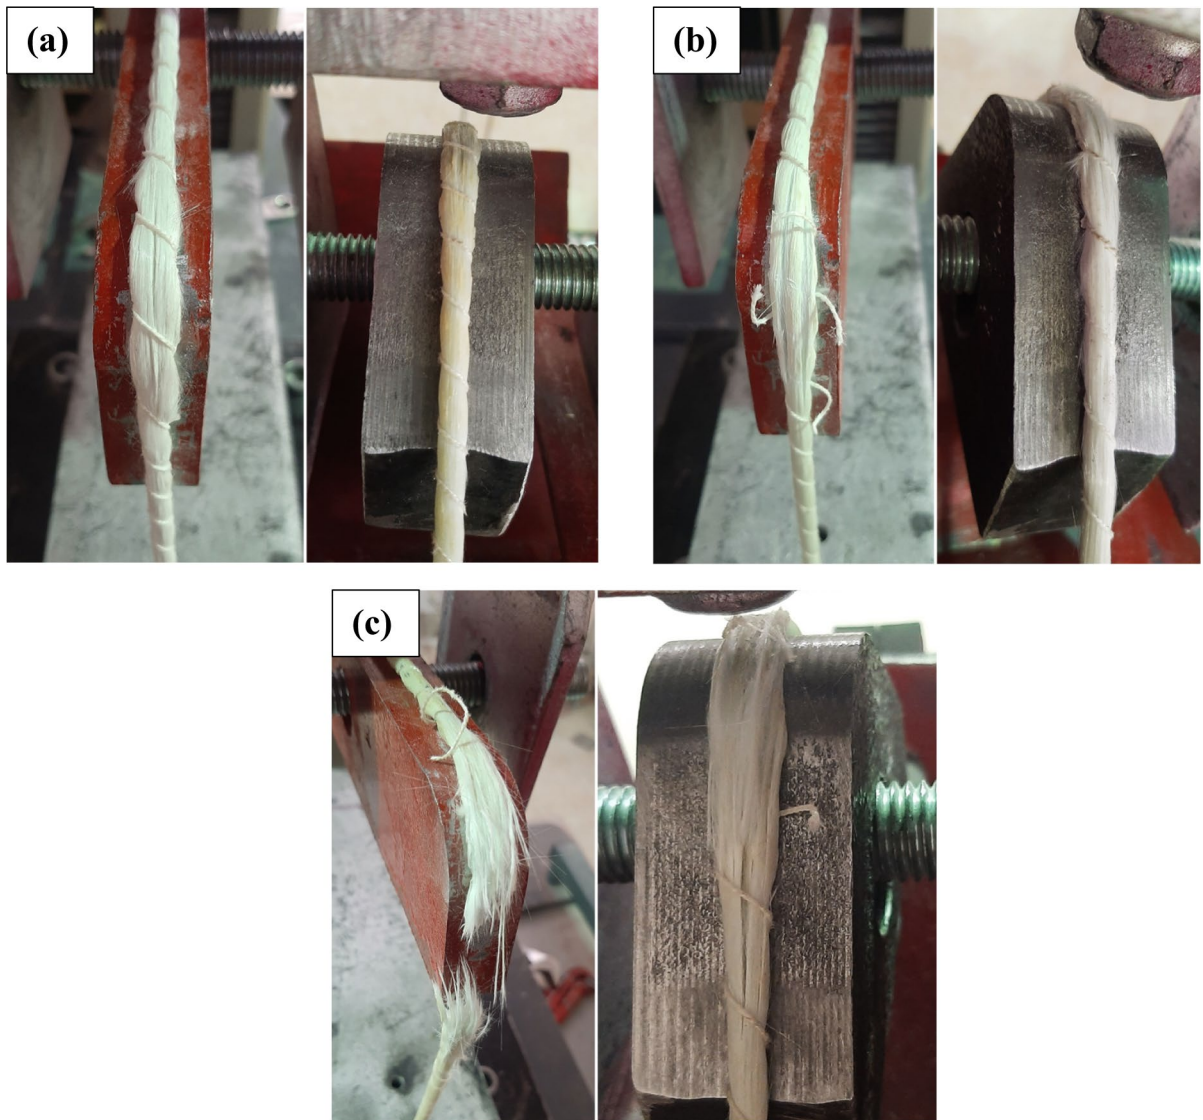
Failure modes of U and L-shaped GFRP stirrups during tests
